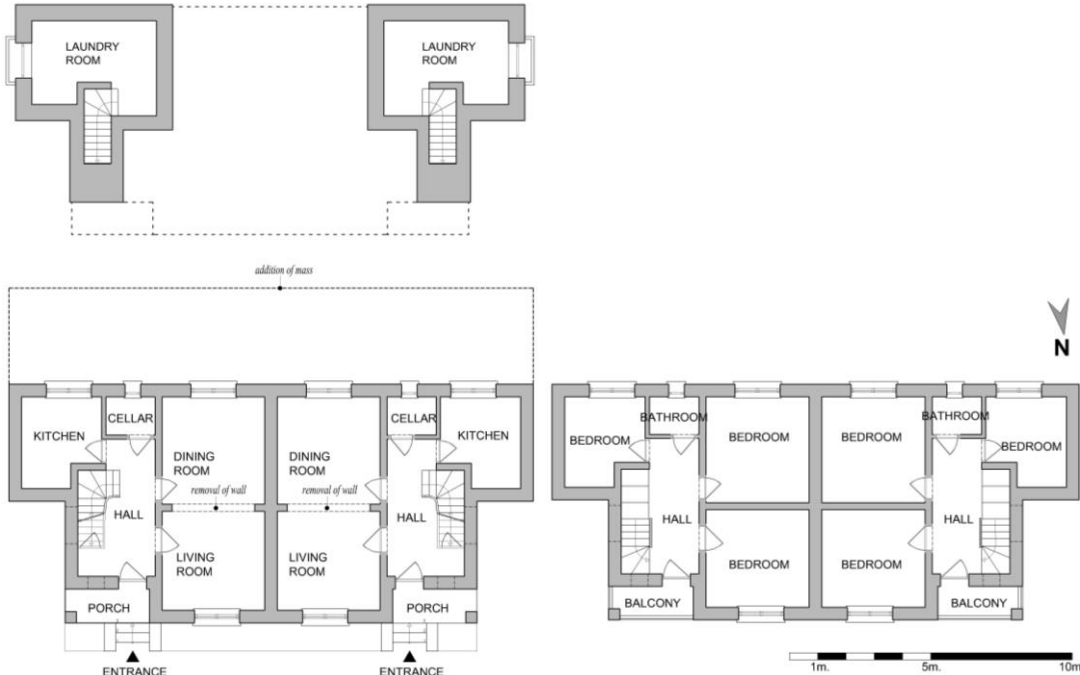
Basement floor, ground floor and first floor plans of Employee Dwelling Type 2
